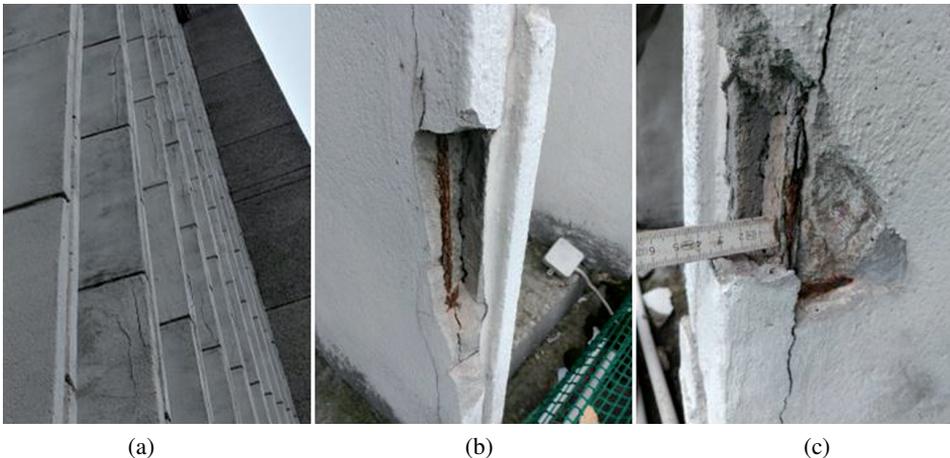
View of extensive damage to façade elements (a); Example of element chipping (b); Measurement of carbonation depth and lagging (c)
